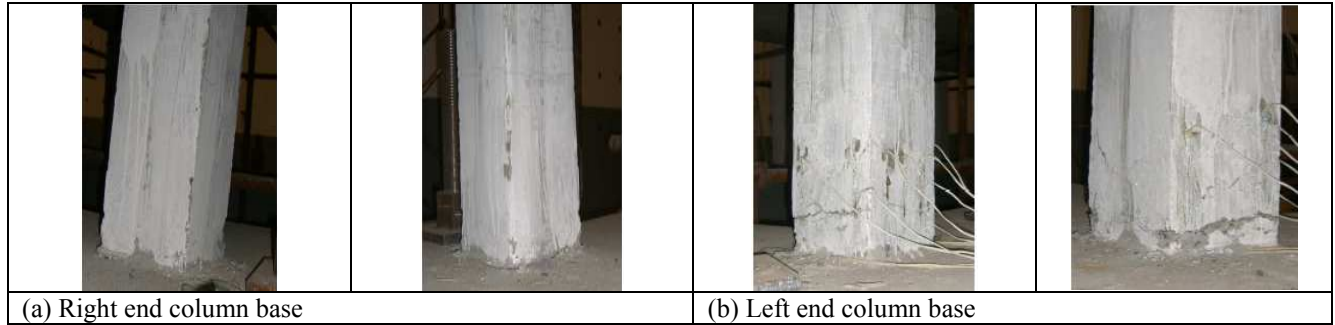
Damage photos at column base sections in PFT at -32kN (Pull) at frame top
